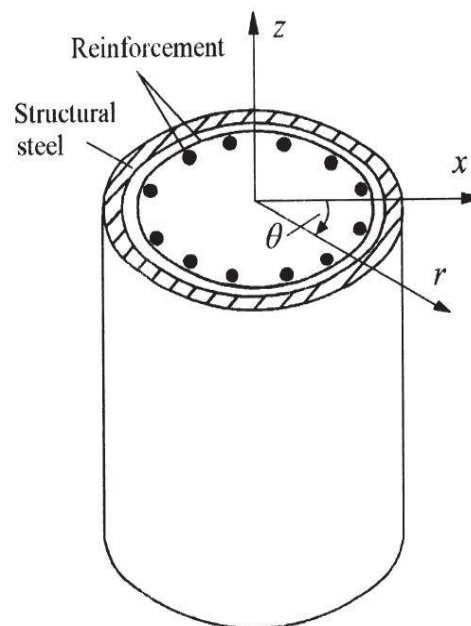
Circular CFST column with longitudinal reinforcement by J. Brauns 1999.
